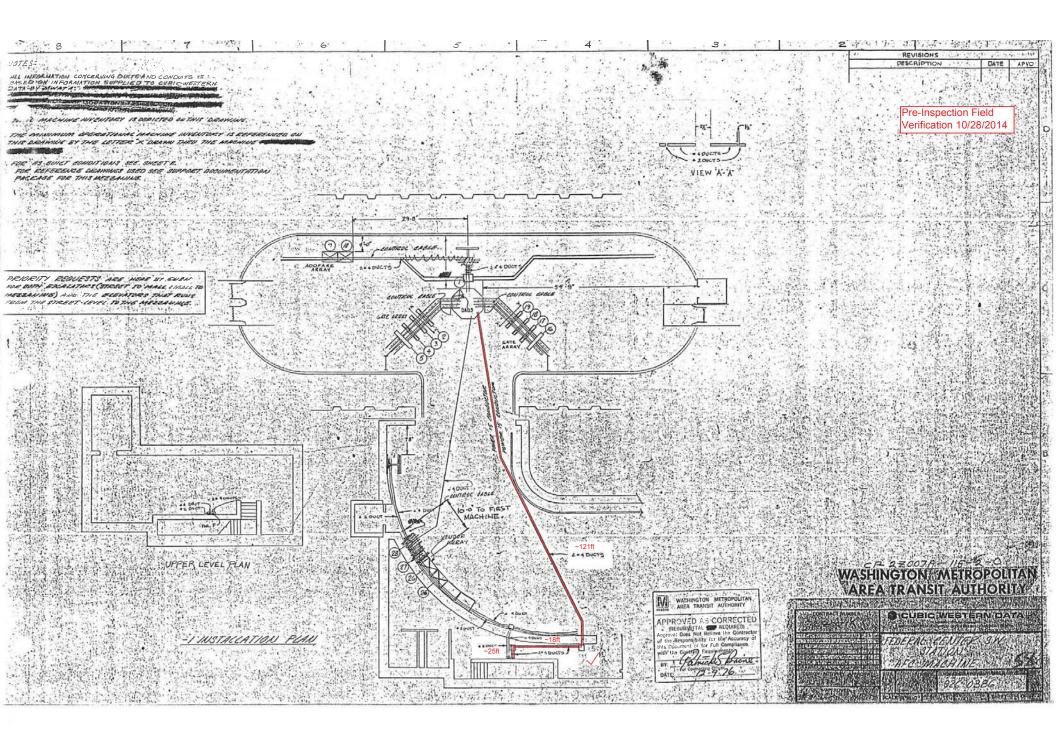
D04 Federal Center SW – AFC Panel F in room 206, Bottom ducts & conduits
